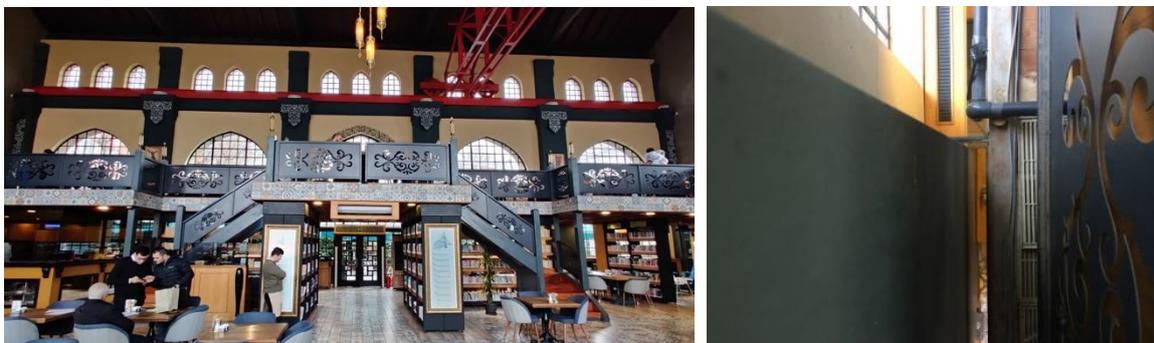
Mezzanine floor and masonry structural wall (Torunbalcı archive, 2019)
